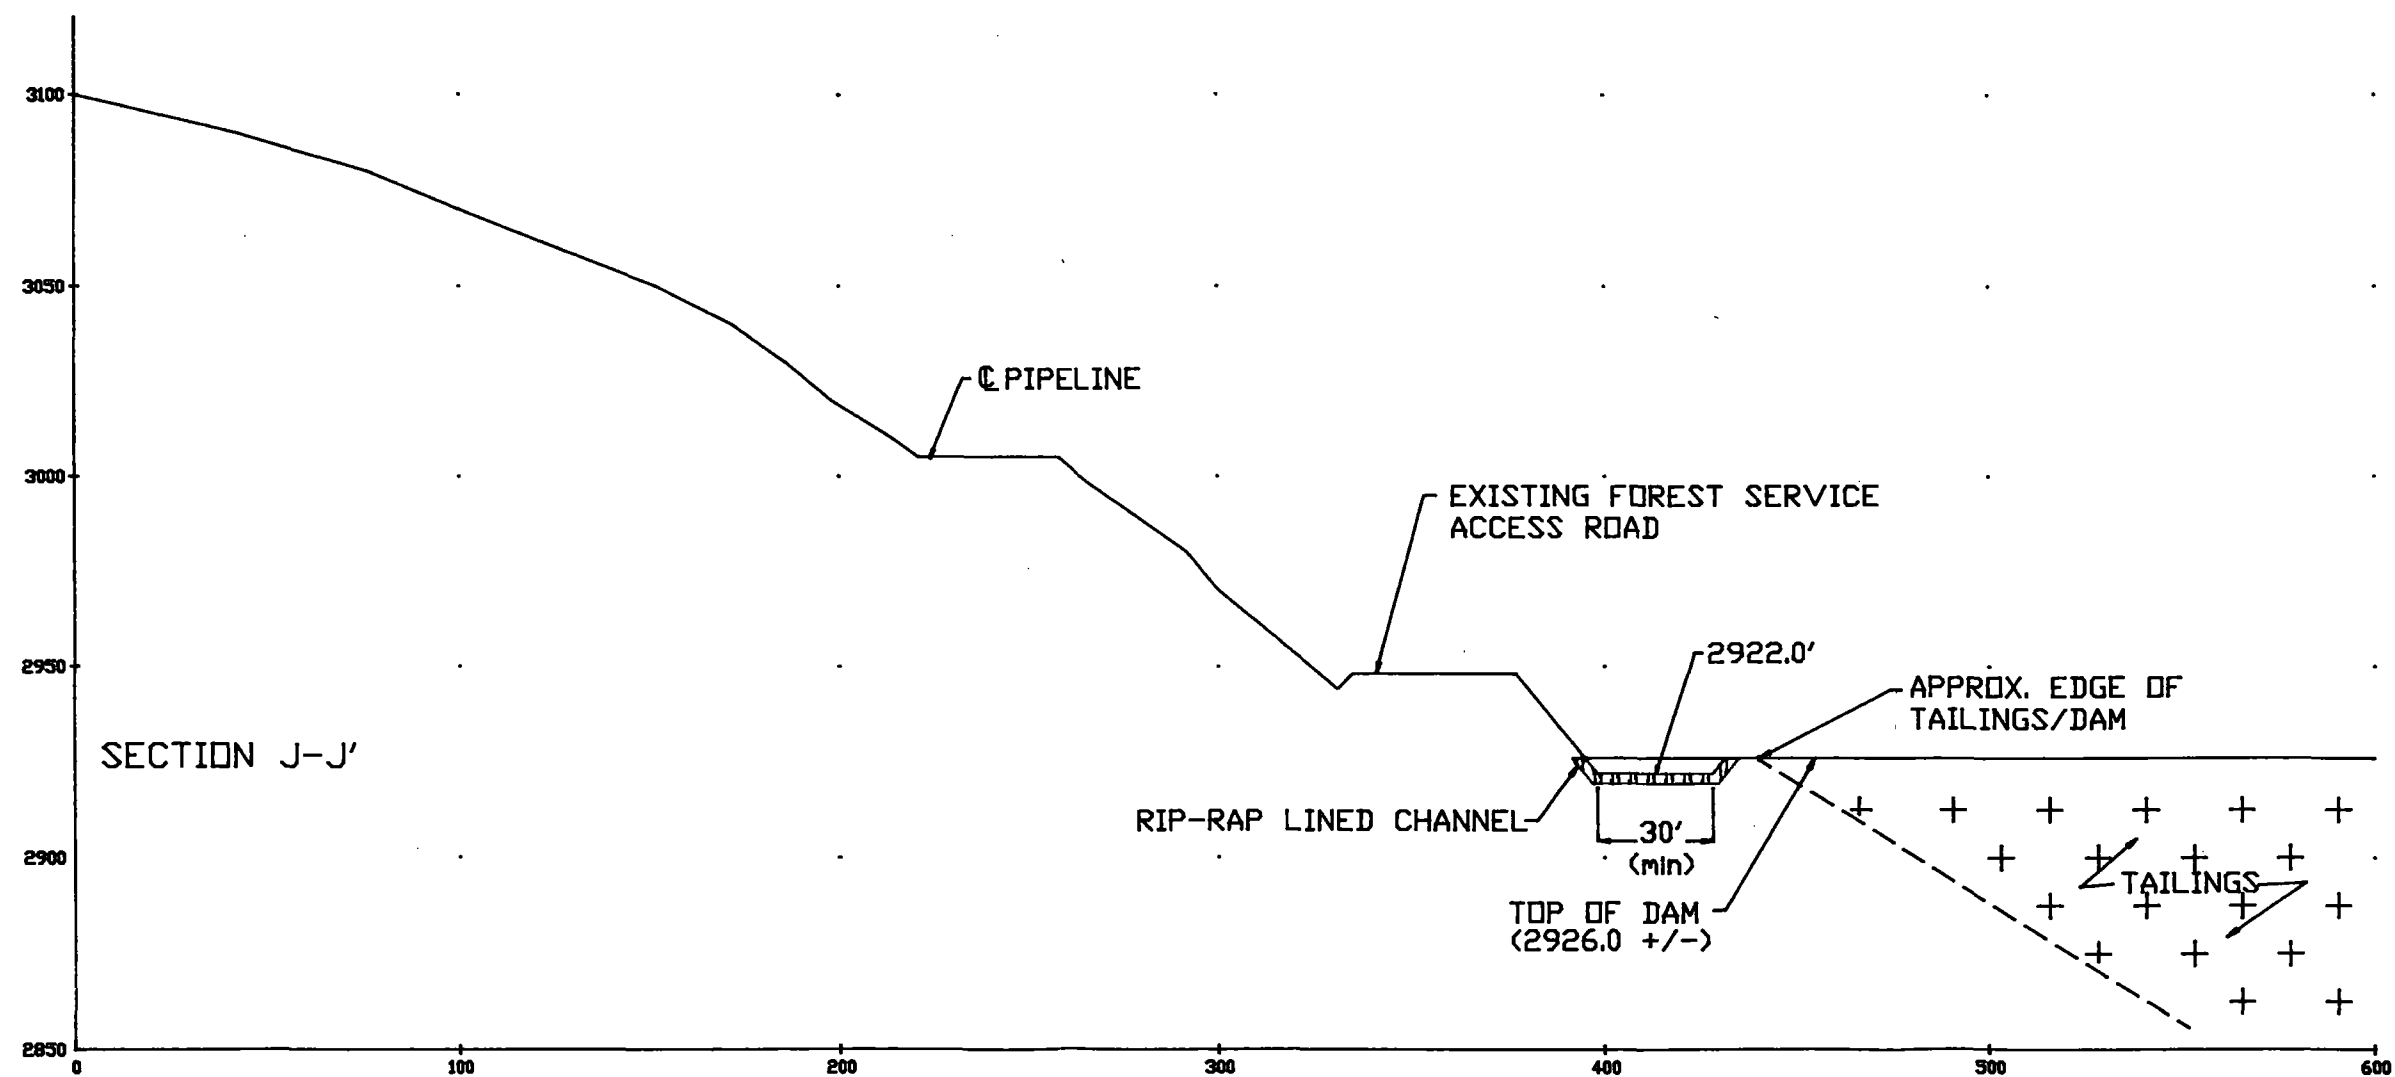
Typical cross-section of the emergency relief spillway for the vermiculite tailings impoundment.
